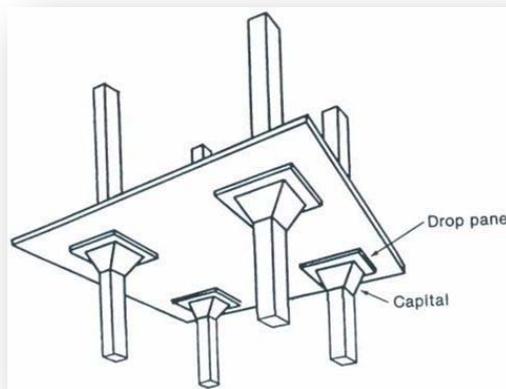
Two-way flat slab with drop panels (www.crsi.com)
